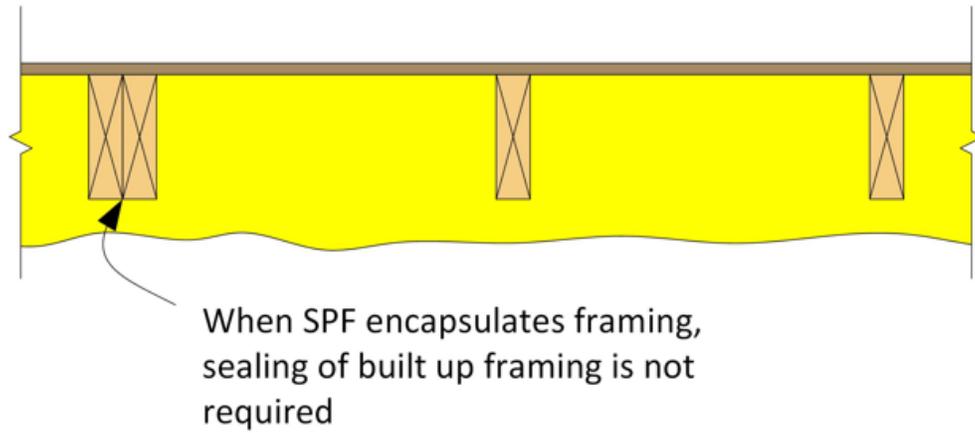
Framing embedded in SPF should be encapsulated when possible to ensure air barrier continuity around the roof framing. (credit image to SFC³)
